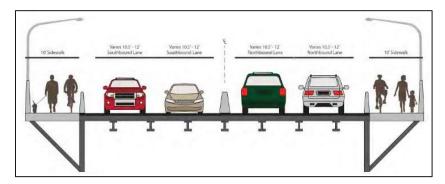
SR 303 Corridor Study Proposed Section, Warren Avenue Bridge
